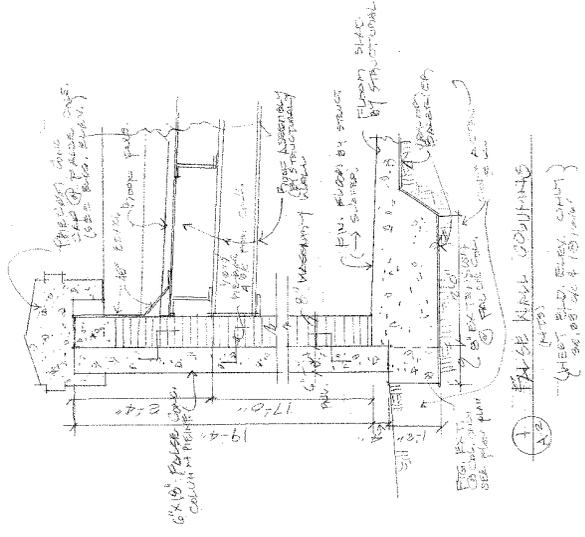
Preliminary Elevations of Covered Parking Structure Detail dated February 17, 2010
